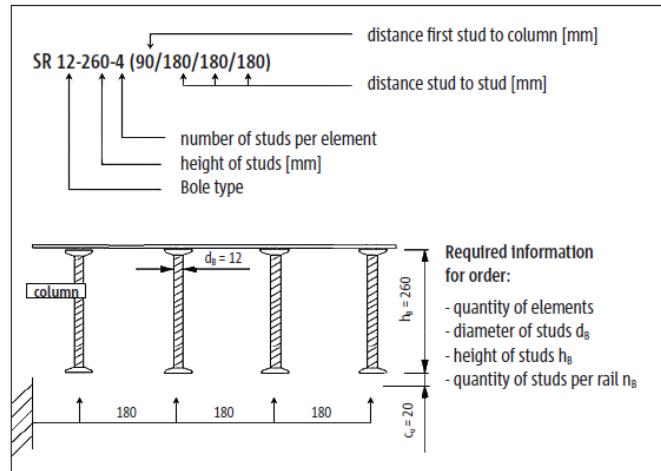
SCHÖCK BOLE SR STUD RAIL INSTALLATION
